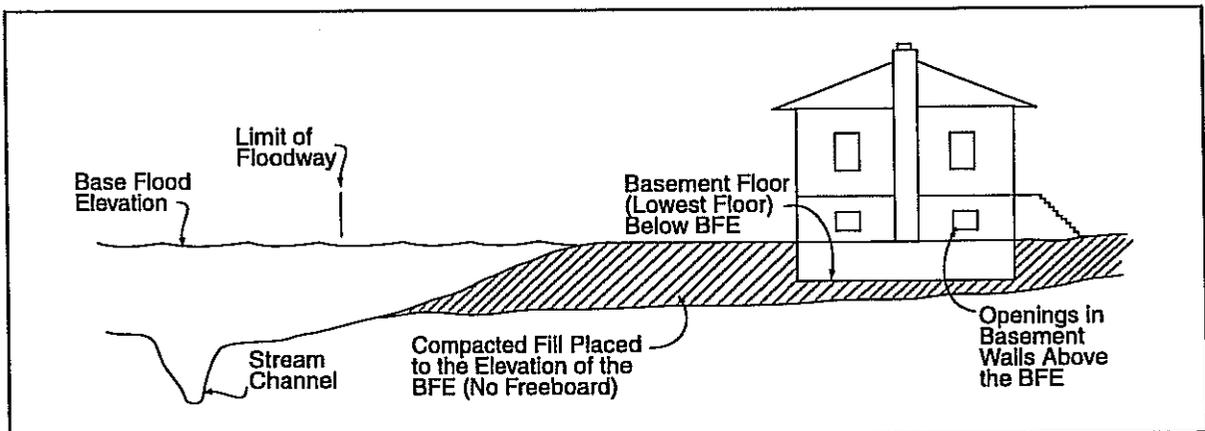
Basement foundation with lowest opening above the BFE. Surface flooding is less likely to enter and inundate the basement.
